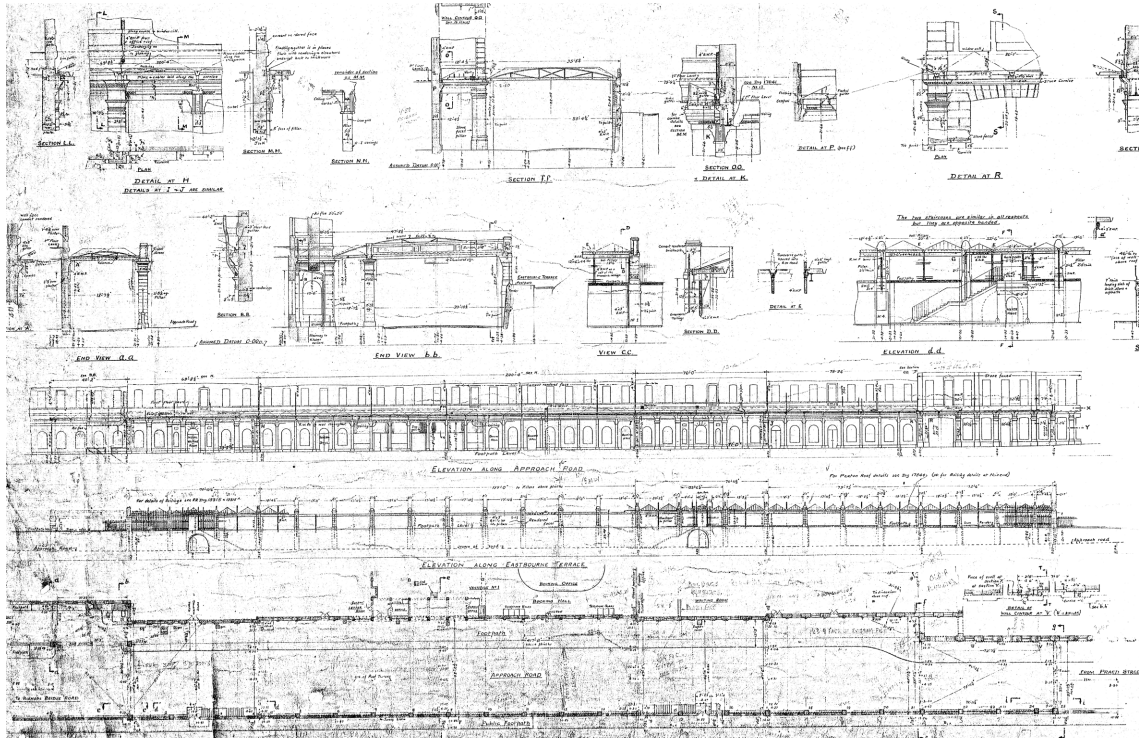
1940 plan and elevations of Departures Road area (Network Rail Archive MF17975)
